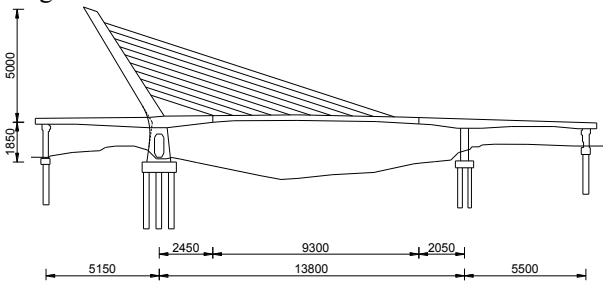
Elevation layout of Dongjiang Lichuan Bridge (unit: cm)
